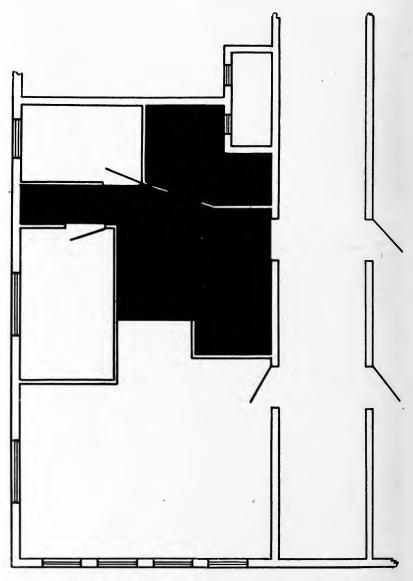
Plate IV. Section of floor plan in a new apartment house (1912). Dining room has "borrowed" light only. Kitchen has opening to a vent shaft several feet under legal size and with an odoriferous garbage chute in it.
